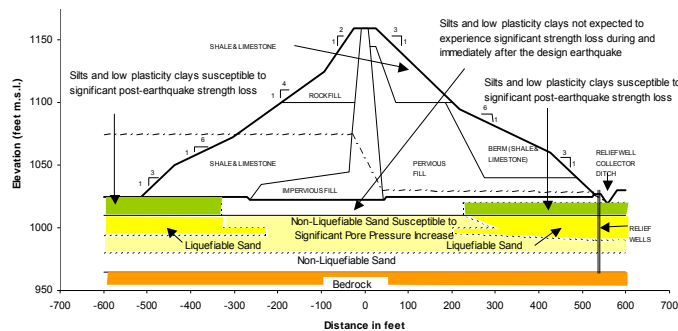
Embankment and foundation zones for Tuttle Creek Dam – distorted scale (Perlea et al. 2004).
